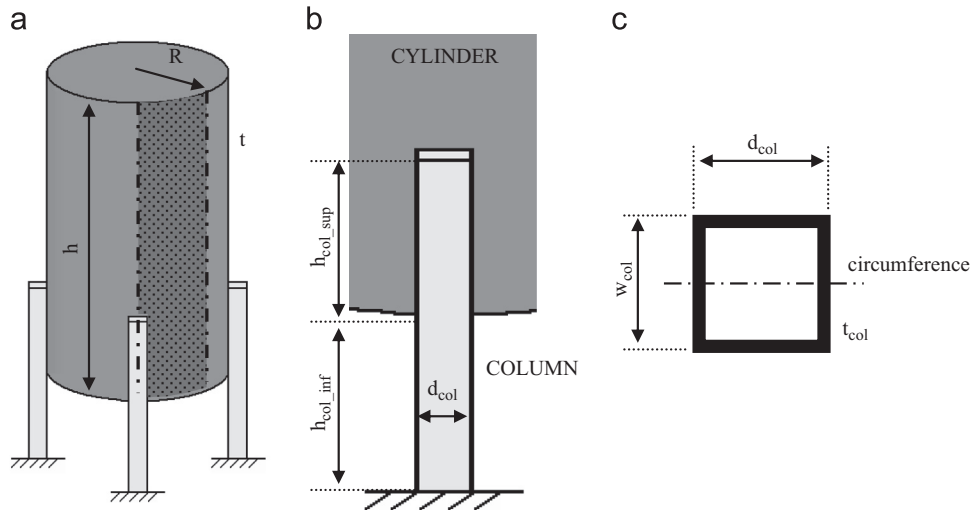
Geometrical parameters of a column-supported cylinder. (a) Cylinder, (b) column – front view and (c) column – cross-section.
